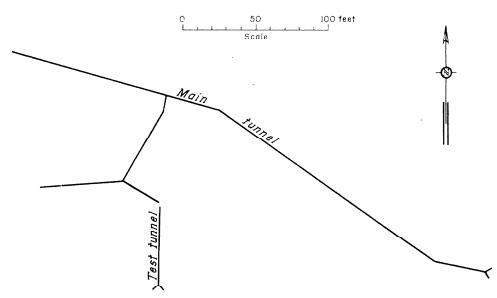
Plan of tunnel 6, Kauai County Akulikuli tunnel.
